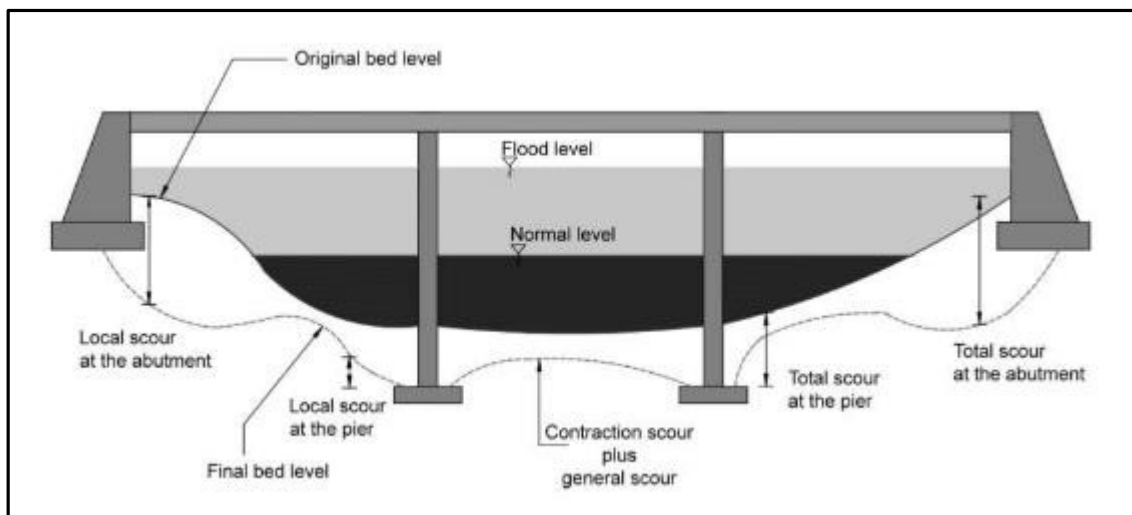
Types of scour around bridge piers and abutments (Melville and Coleman, 2000).
